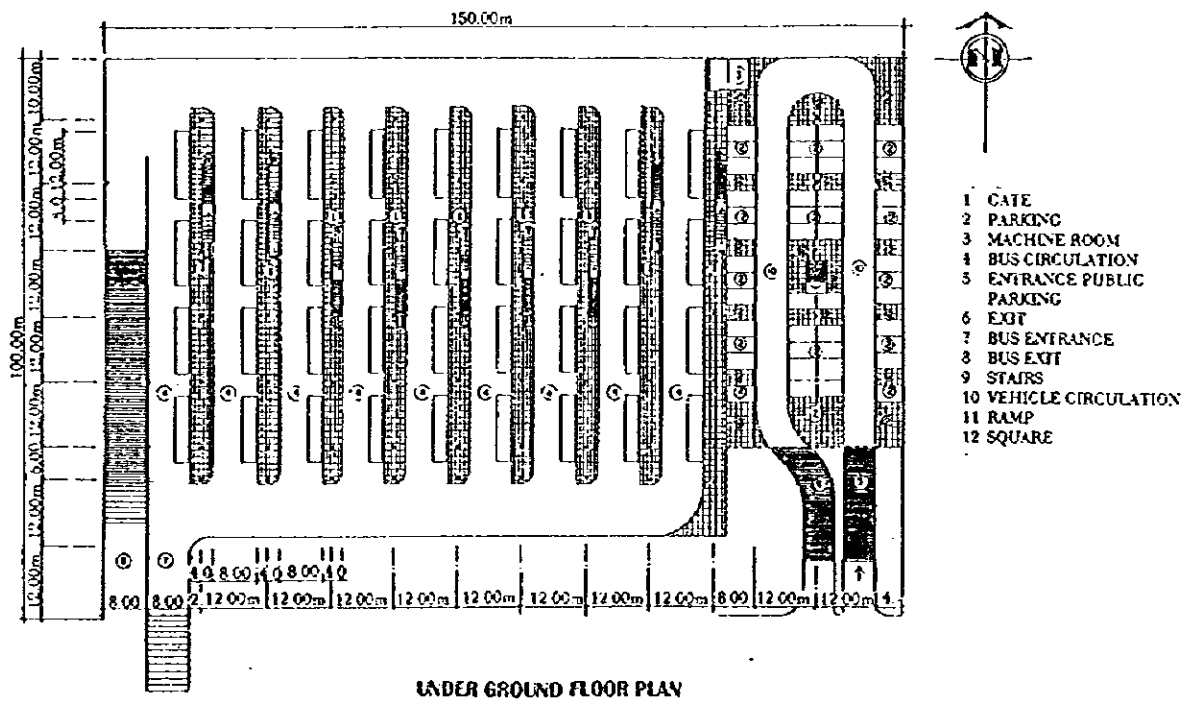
Ground Floor Plan of West Interregional Bus Terminal
